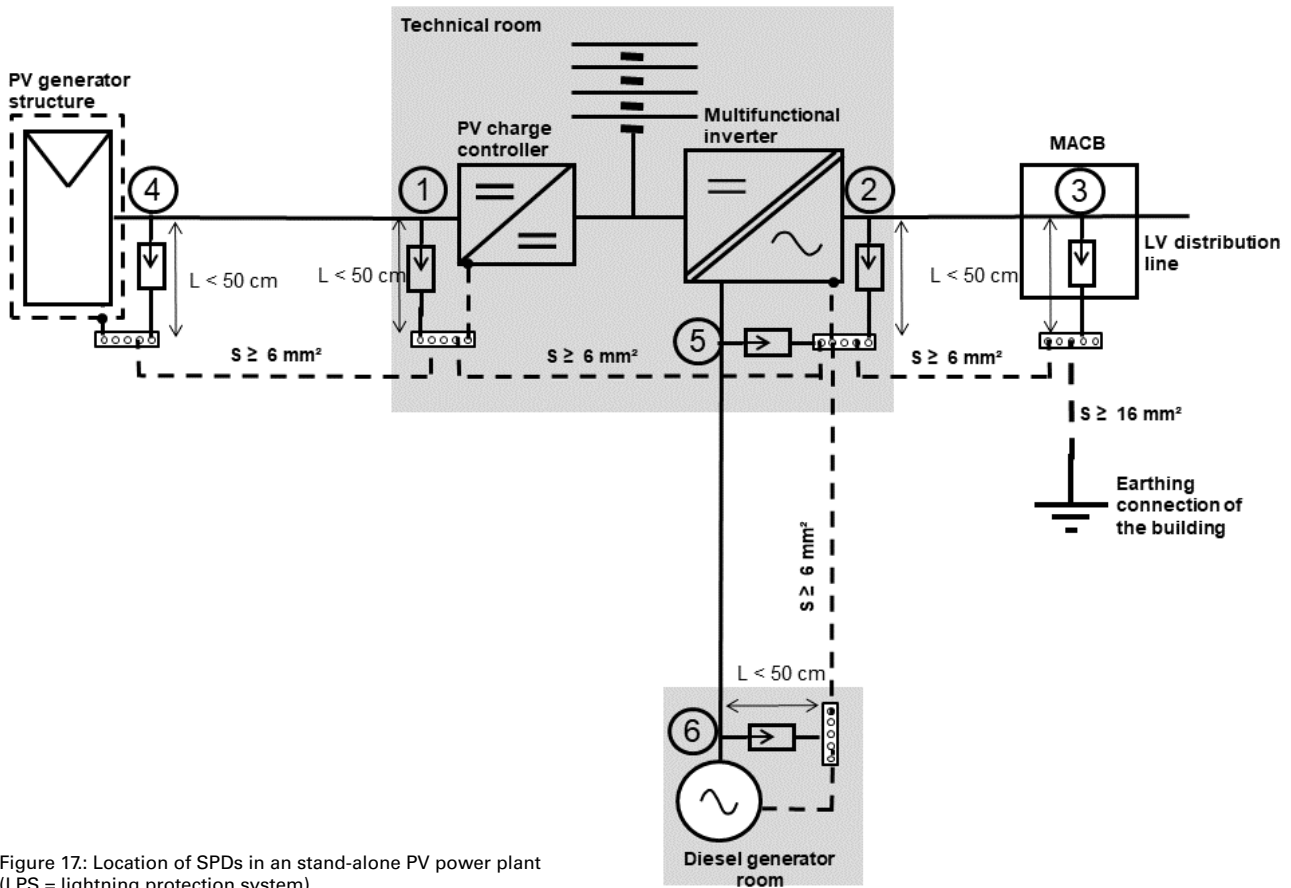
Location of SPDs in a stand-alone PV power plant (LPS = lightning protection system)
